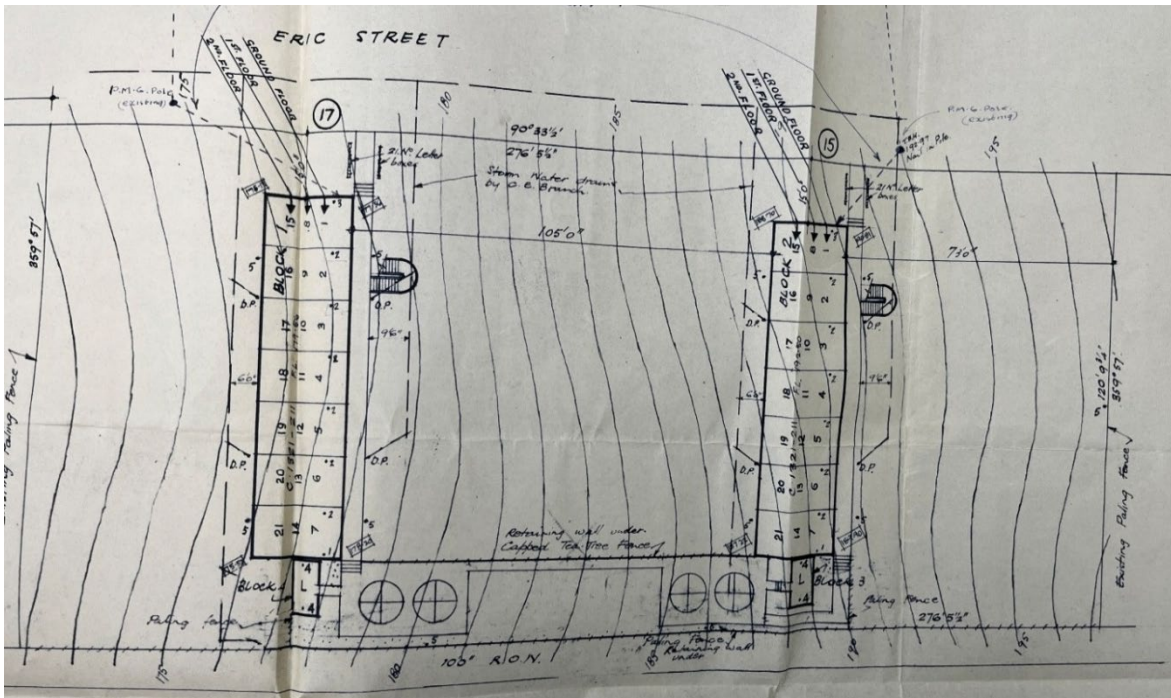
Site plan for flats at 15-17 Eric Street, Preston, December 1960
